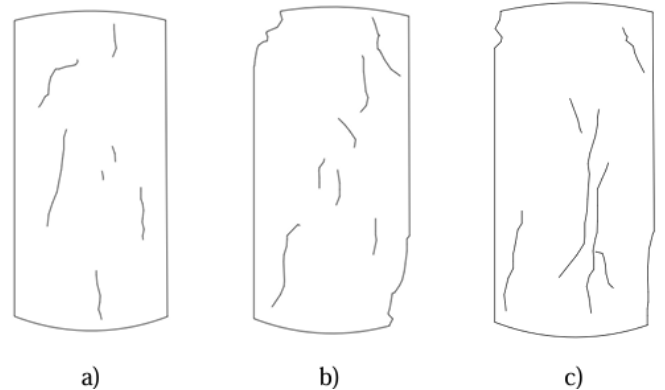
Crack patterns of SB samples aged 7 days a) SB 1; b) SB 2; c) SB 3
